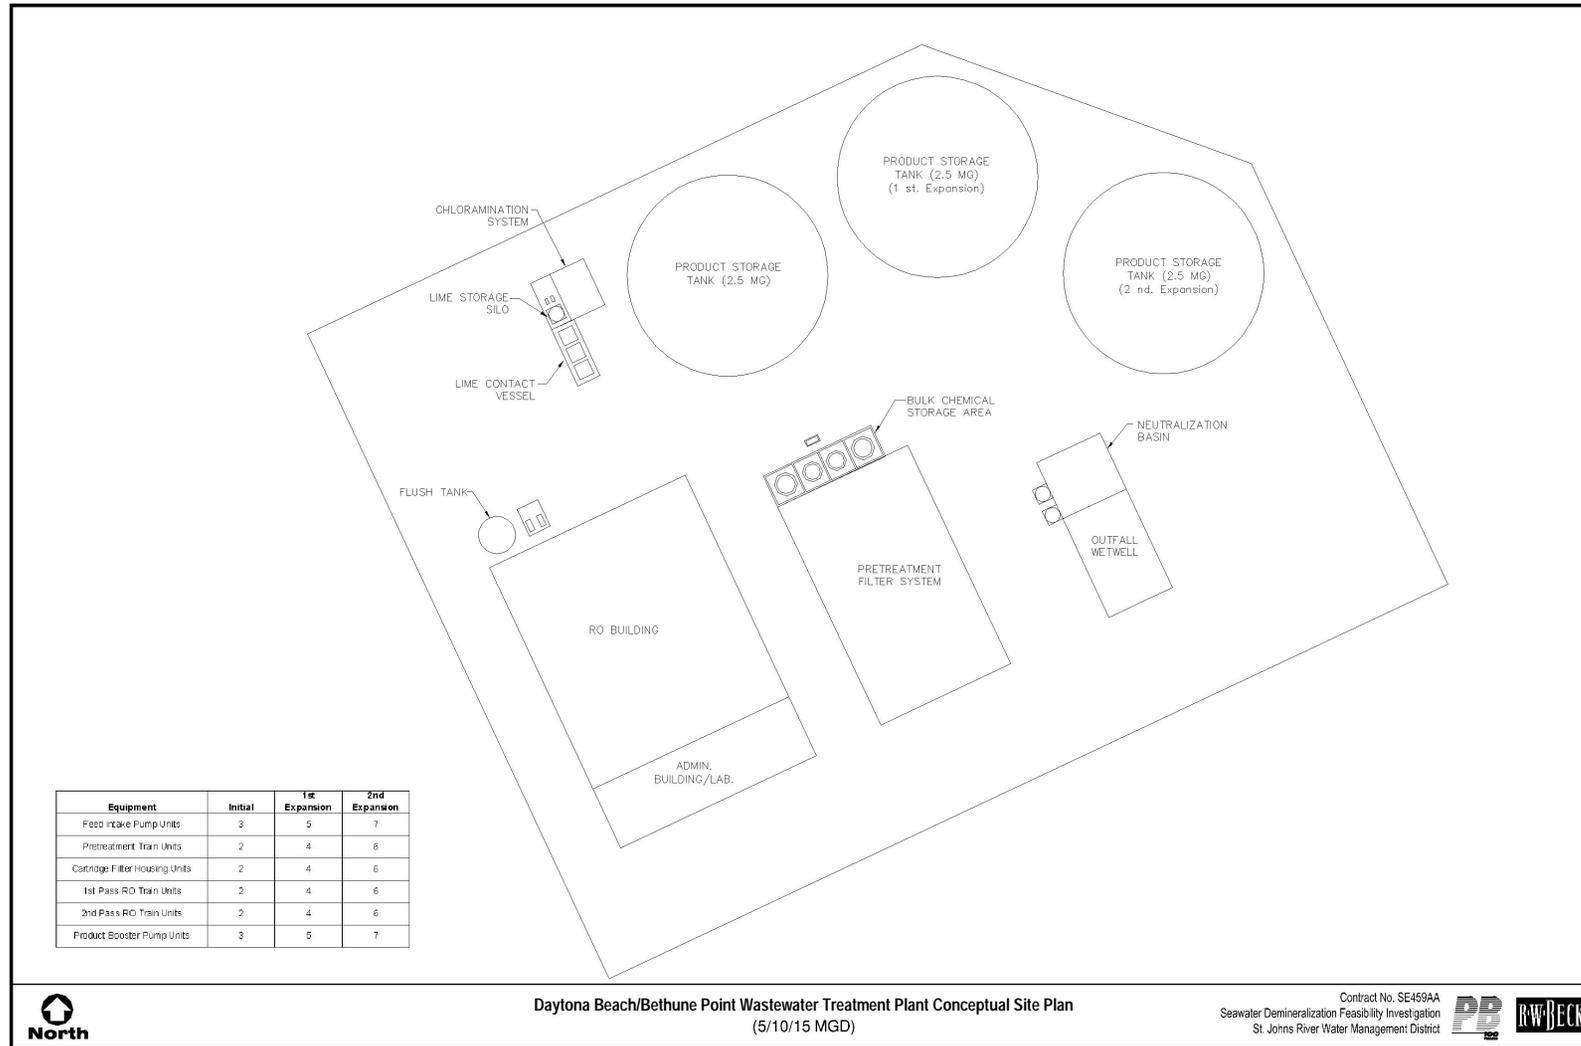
Daytona Beach/Bethune Point Wastewater Treatment Plant Conceptual Site Plan
